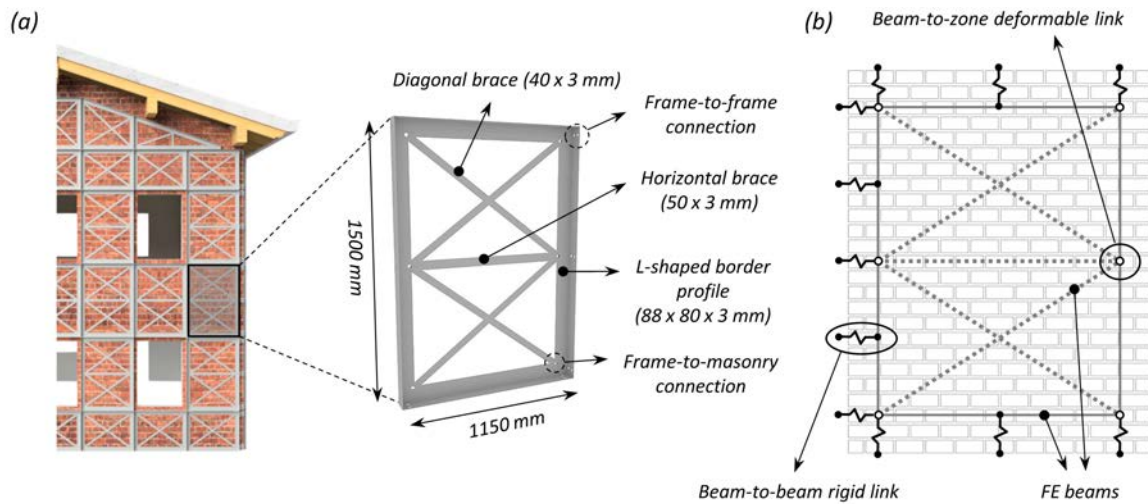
Retrofit system modelling: (a) layout and steel module details; (b) numerical layout.
